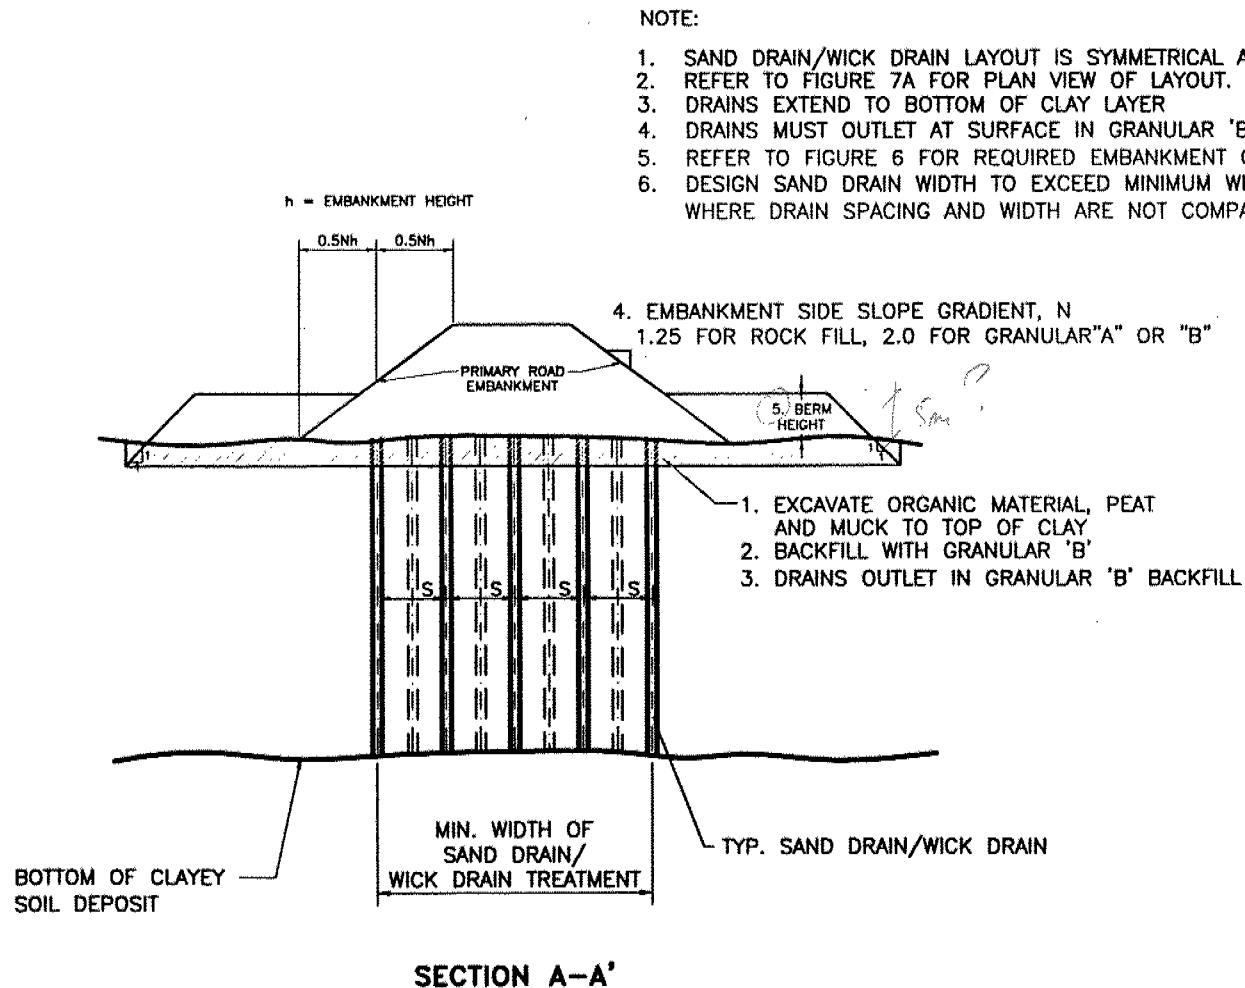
B: SAND DRAIN/WICK DRAIN LAYOUT. HIGHWAY 69, 0.4km SOUTH OF MUSQUASH RIVER, NORTHERLY 8.9 km TO TOWER ROAD - SECTION VIEW
